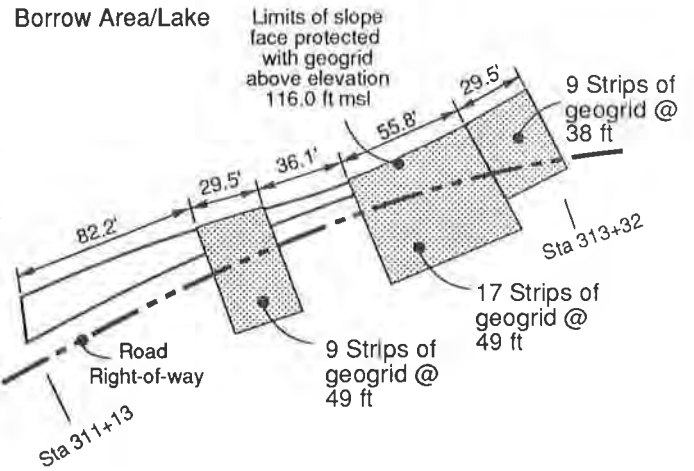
Typical geogrid layout plan for elevation +116.0 msl
